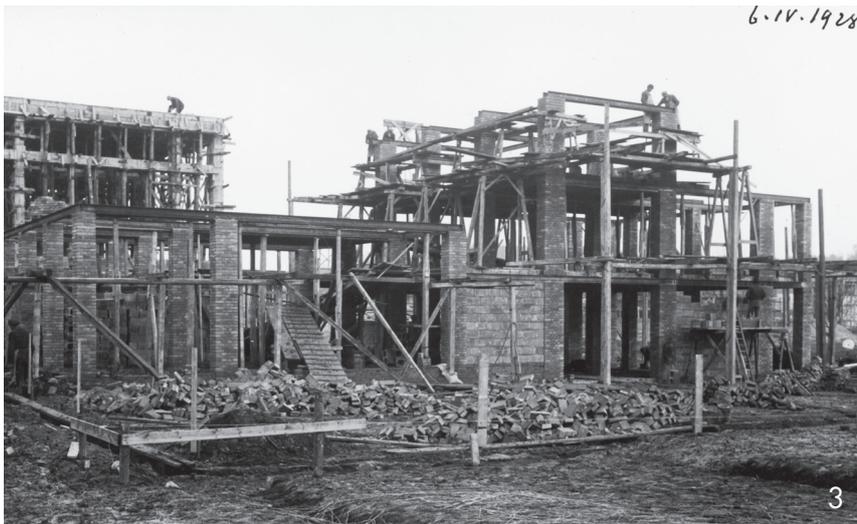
Fairgrounds, Pavilion of Arts and Crafts School in Prague by Pavel Janák during construction (1927–28). Brick-clad concrete base, hollow block brick wall, wood chip board, steel girders. Photo by the National Technical Museum in Prague.
